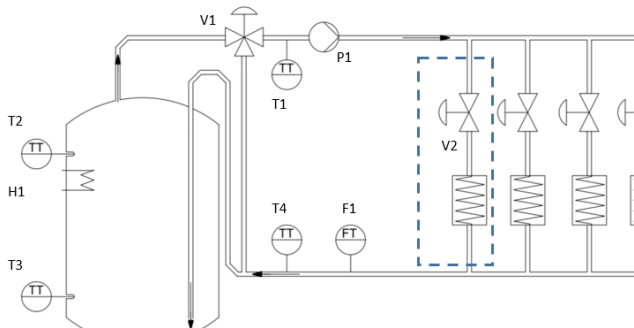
Overview of heating system in building, with hot water buffer tank for heating the water, and floor heating pipes for each room in the building. Each pipe has a valve controlled by the BEMS. The hot water tank is to the left in the figure.
